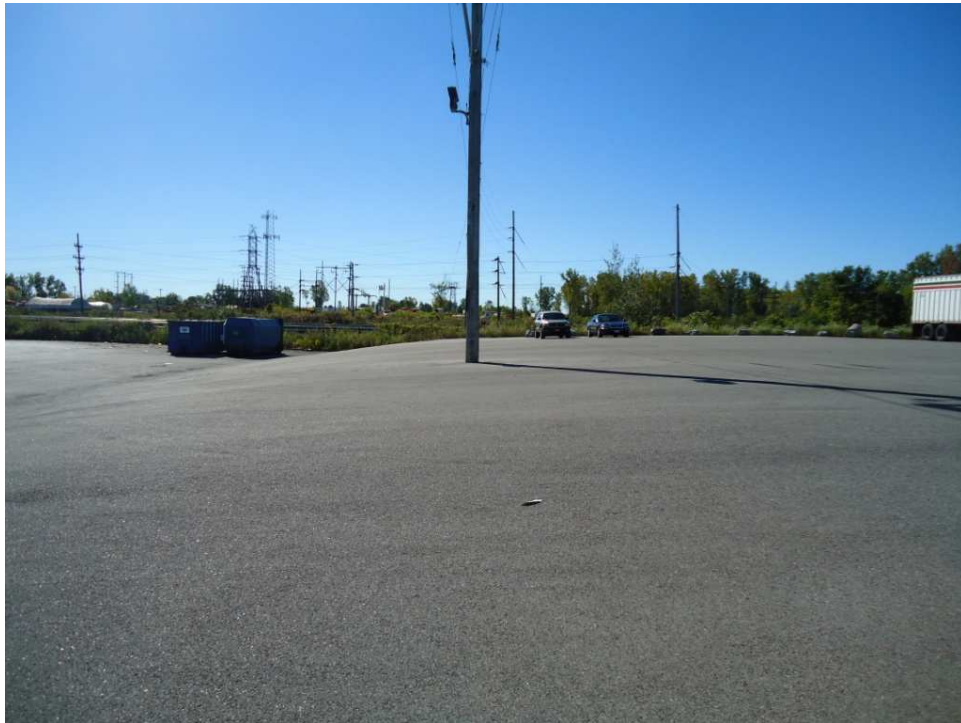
GCL and Asphalt Cover System looking south across east slope.
